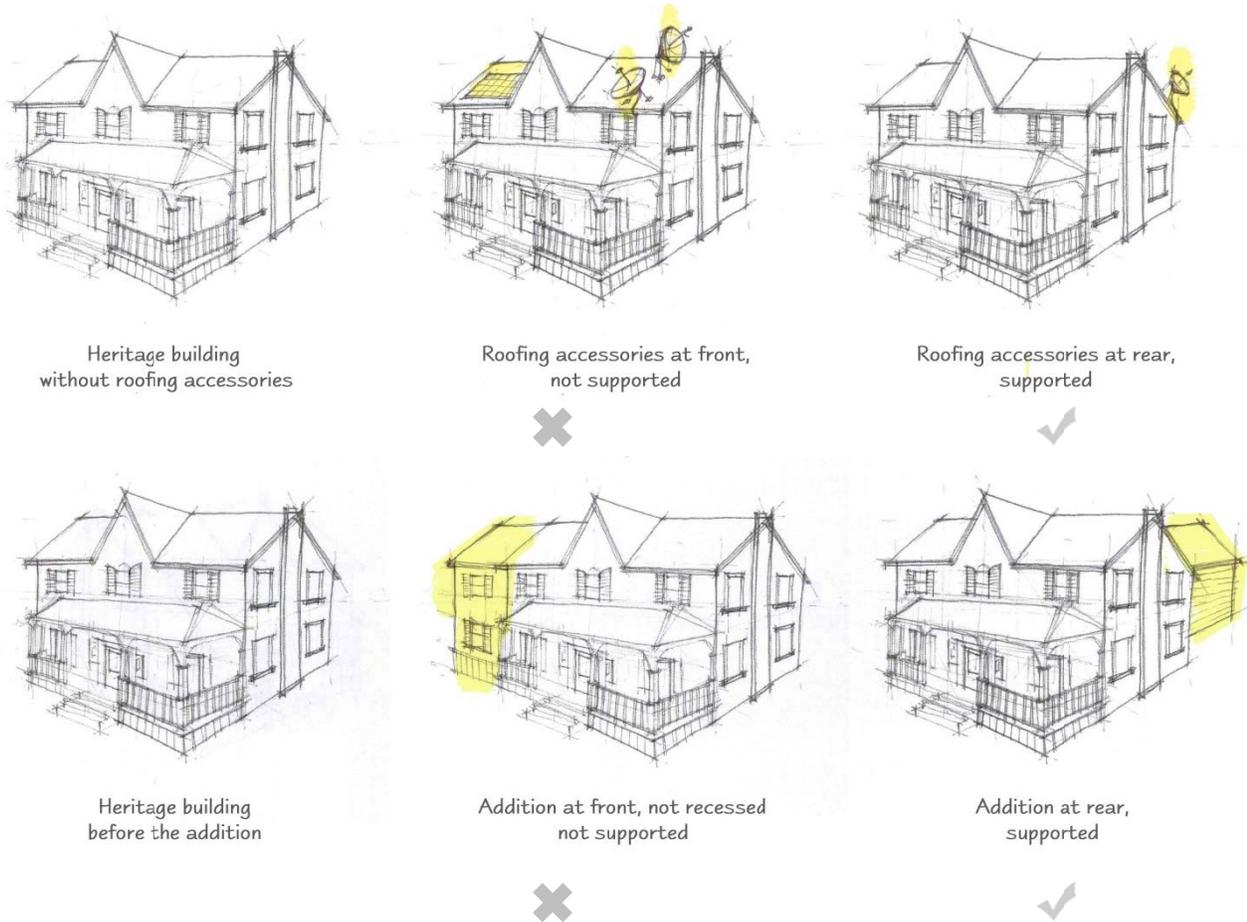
Additions, Dormers, and Roof Accessories, Examples not Supported
